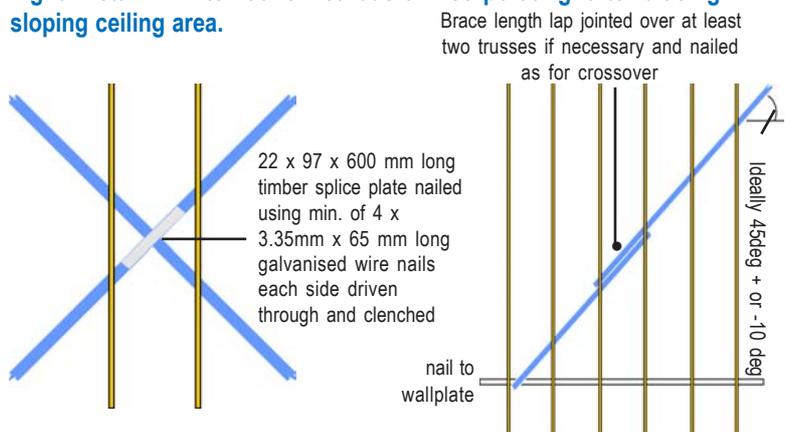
Splicing of intersecting diagonal braces and end jointing
